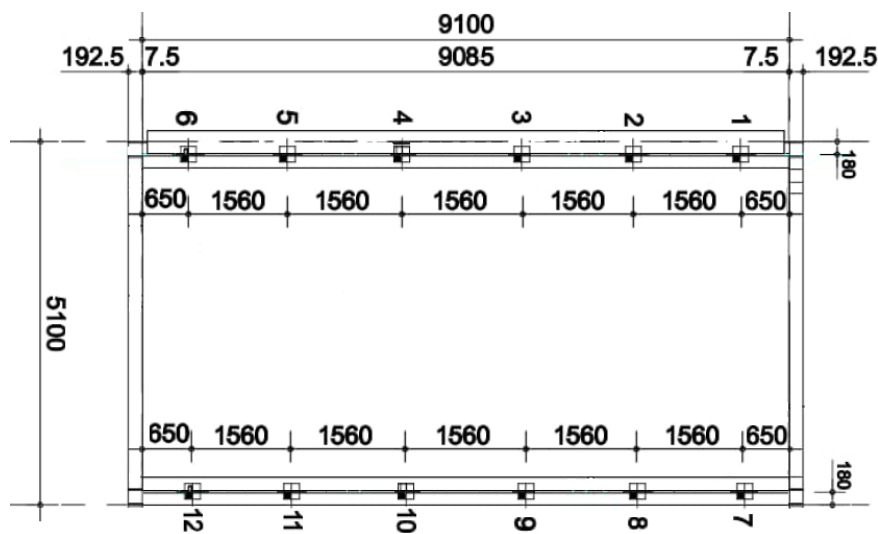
Foundation plan for 12 timber foundation piles [3]
